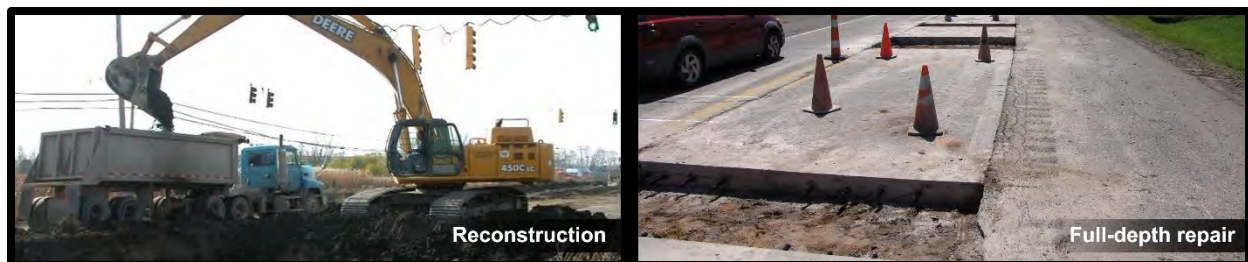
Examples of reconstruction treatments—(left) reconstructing a road and (right) road prepared for full-depth repair.
